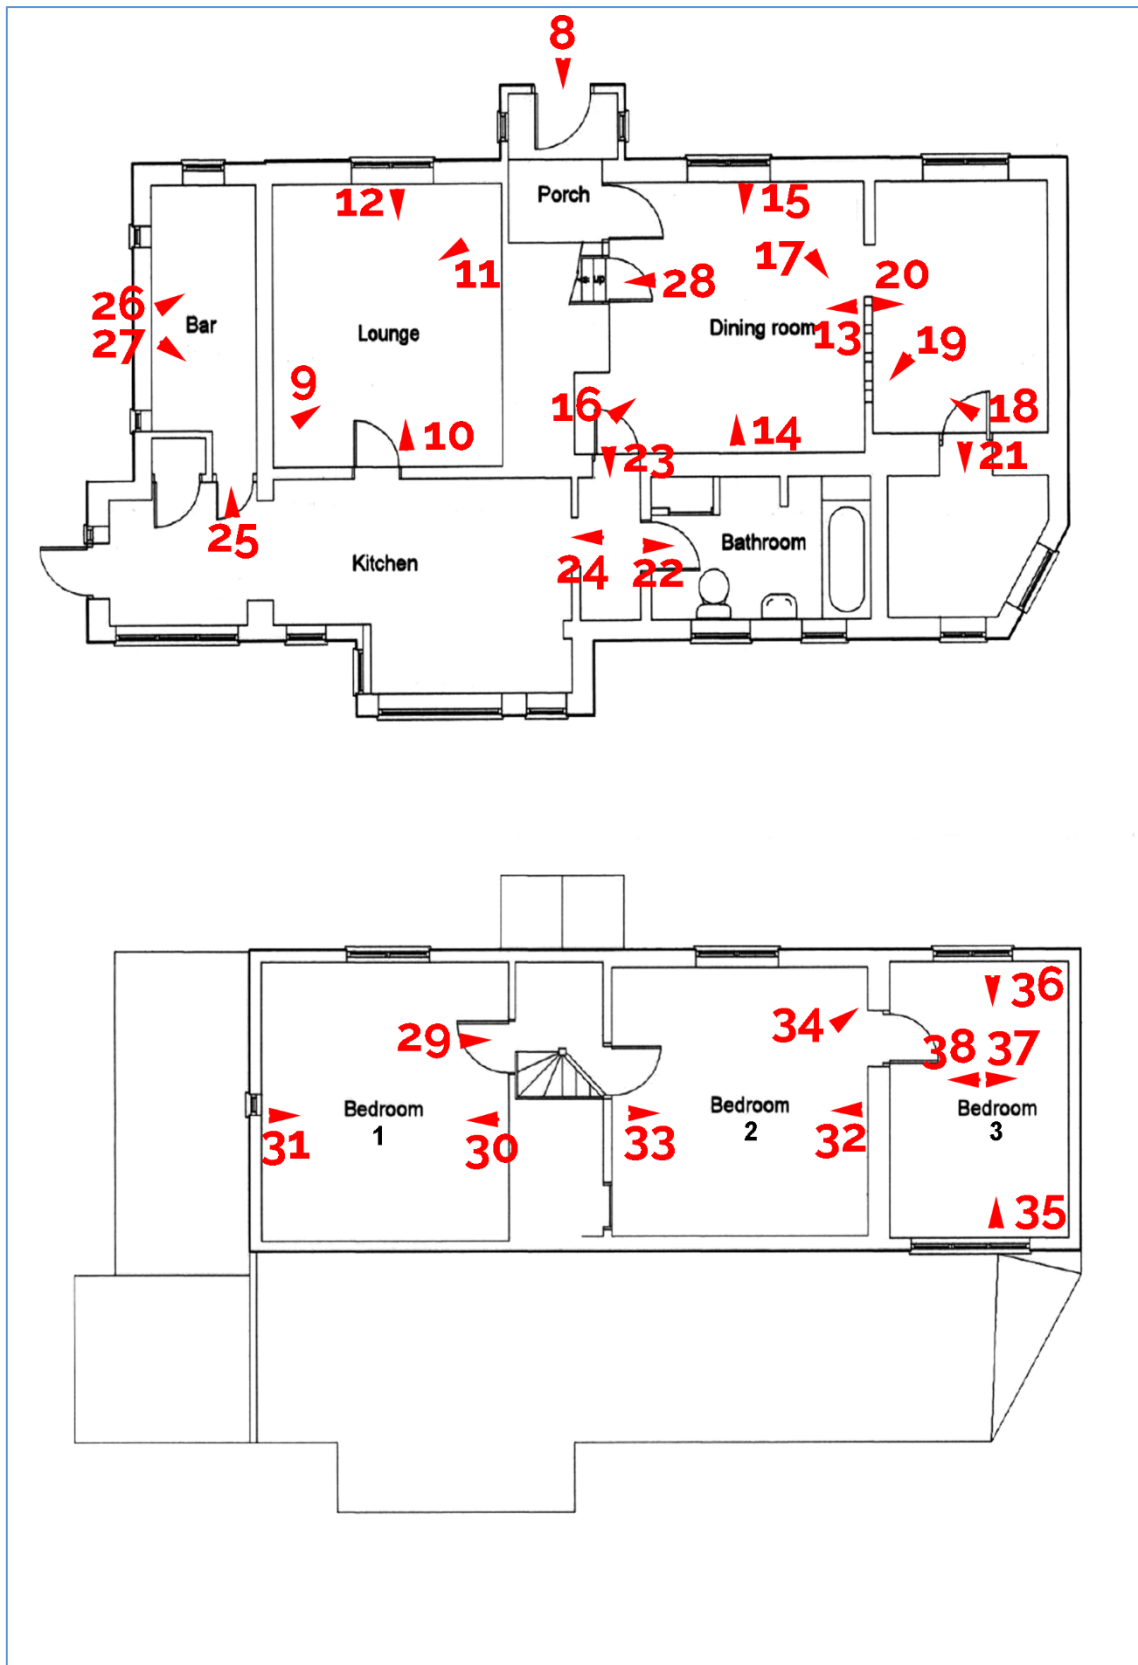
Ground-floor plan (top) and first-floor plan (bottom) indicating the locations and direction of the numbered interior photographs reproduced in this report at 1:100.
